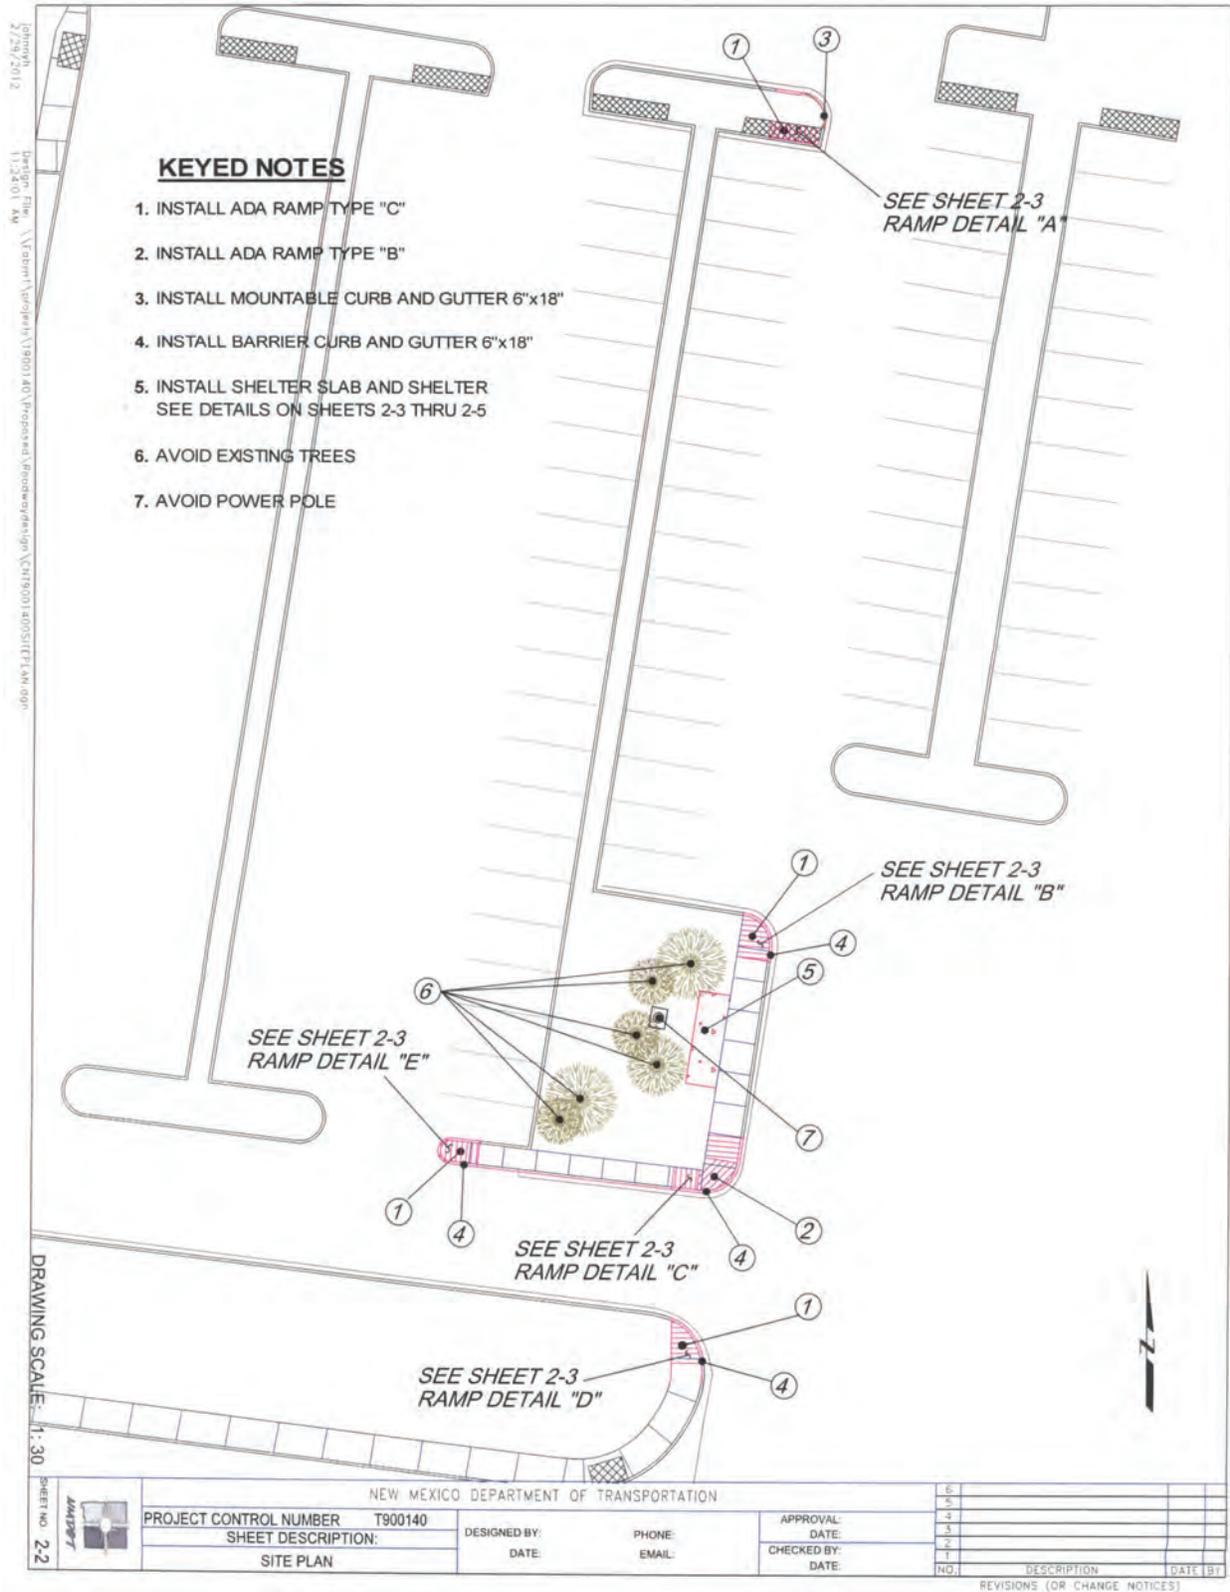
Former PERA Building Park & Ride Shelter and ADA Ramp Project plan.
